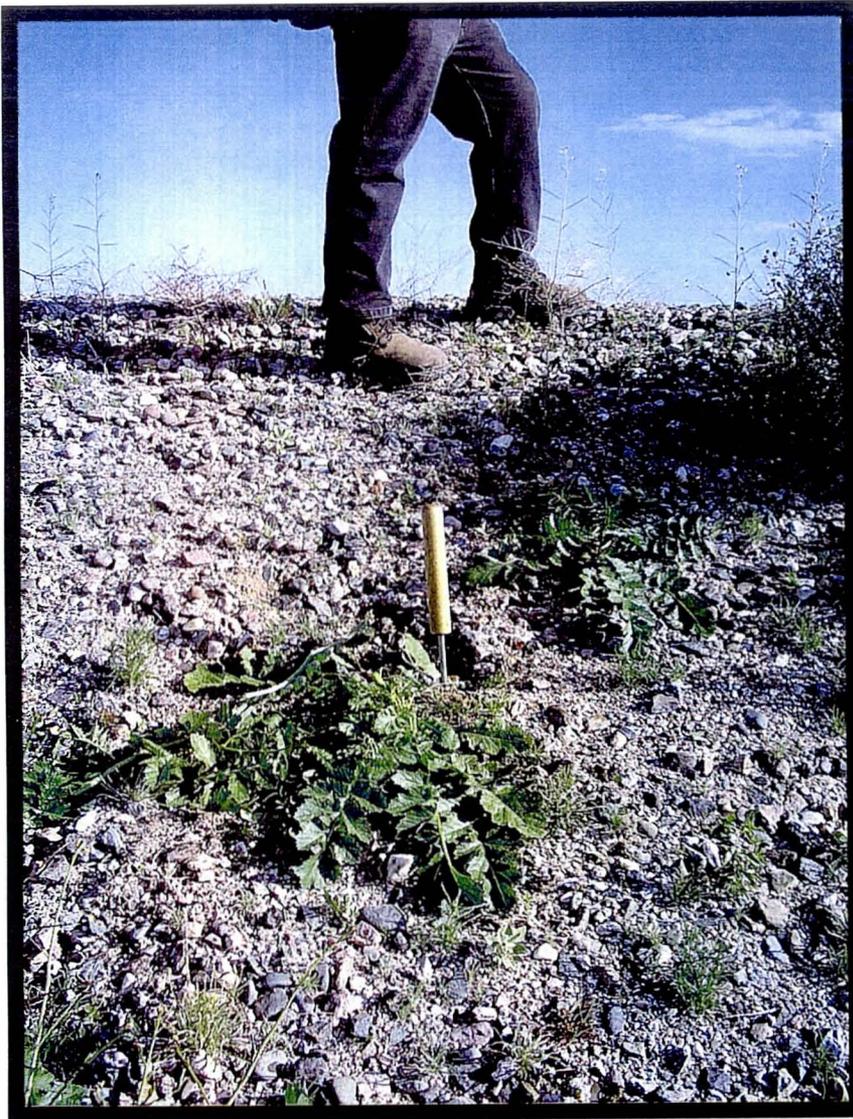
Reach 2, Station 469+48: 2.5-foot deep hole off of downstream shoulder.
